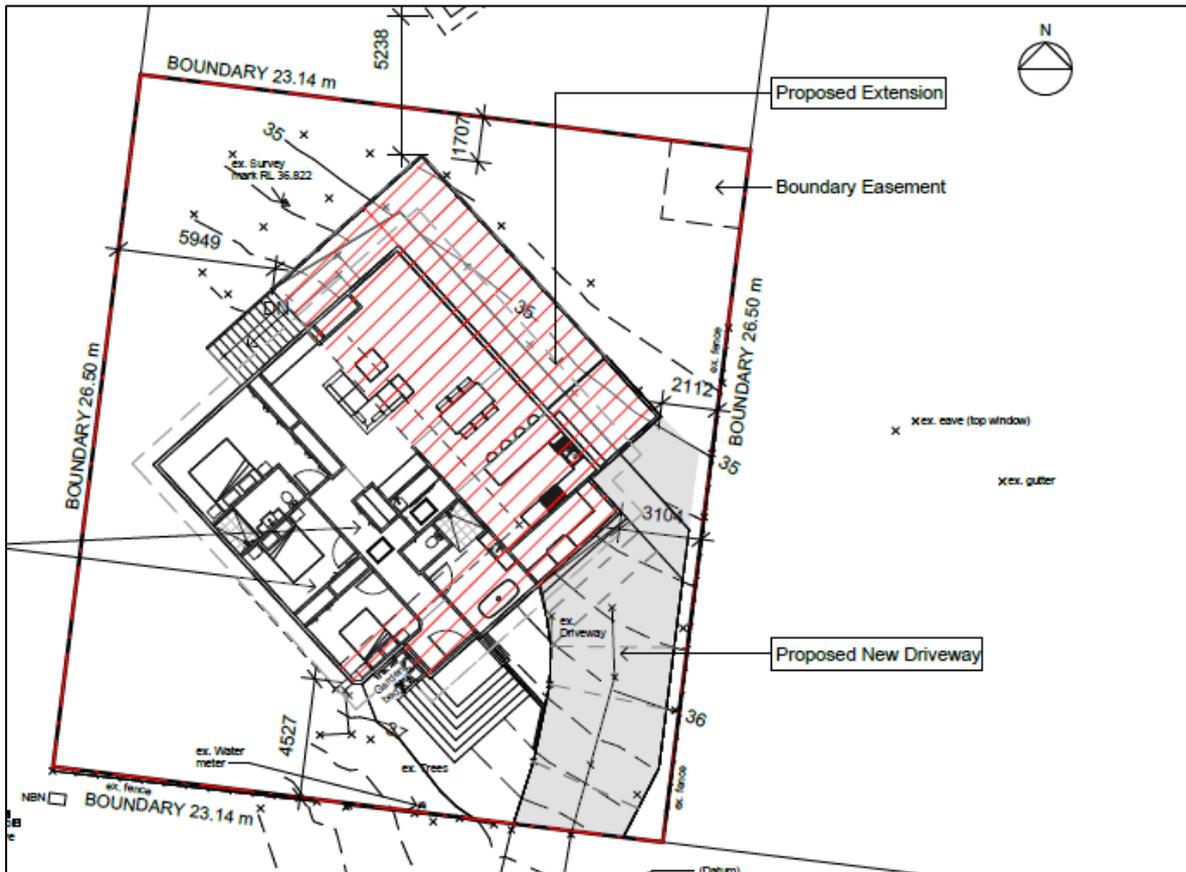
Site plan with proposed floor plan with added and altered floor area (red lines) and driveway expansion.
